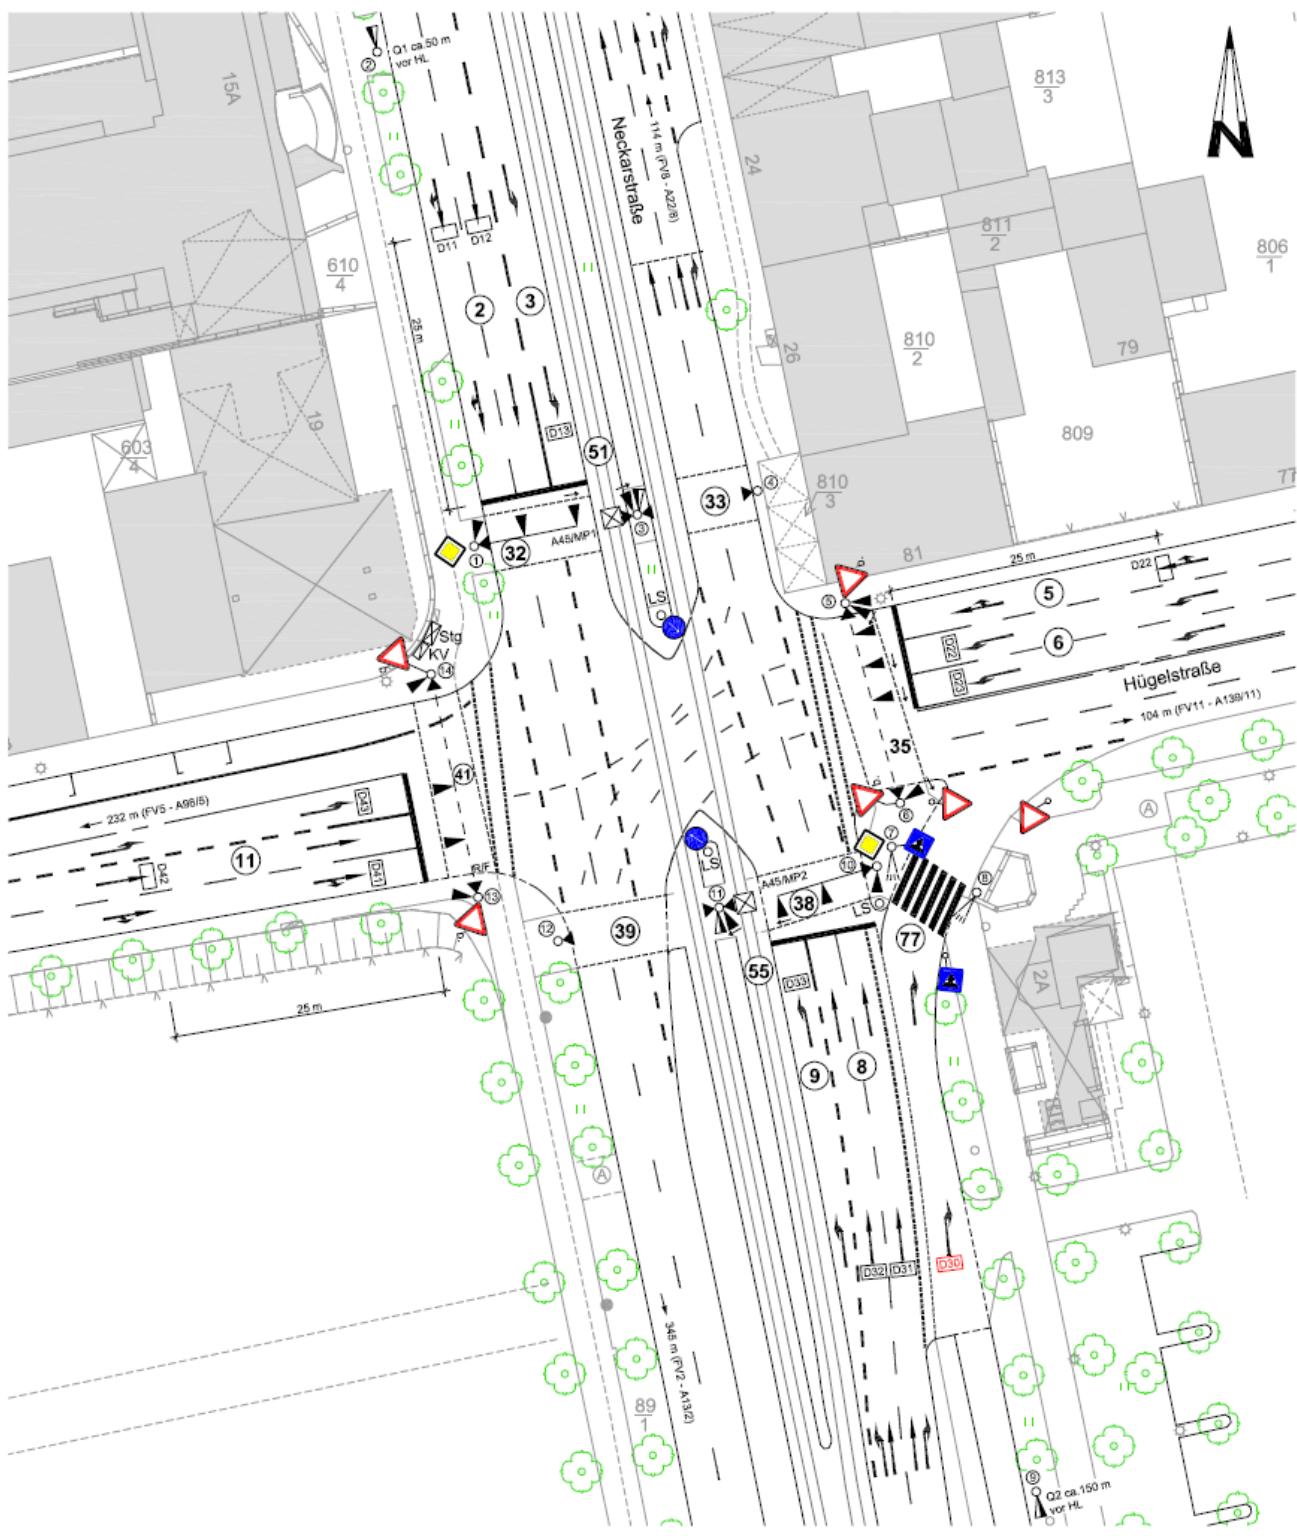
junction Layout of A45 Intersection, Darmstadt (Source: Darmstadt Town hall)
